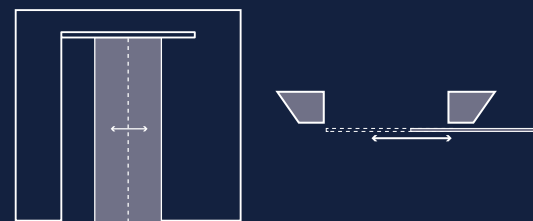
DETAILS OF NEW SINEA DISAPPEARING SLIDING DOOR
